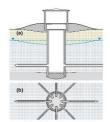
Typical set-up of a radial collector well: (a) cross-section, (b) plan view. Figure: Houben et al. 2022
